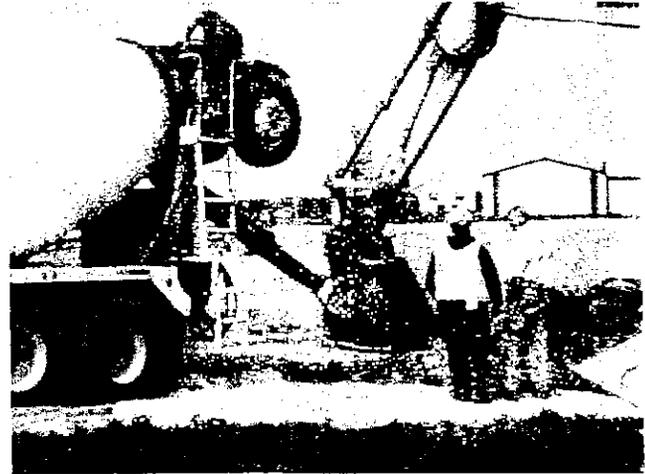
(LEFT). Cement trucks were washing out along the side of SR 83 in an area just upslope of a storm drain. No washout pit had been provided.
